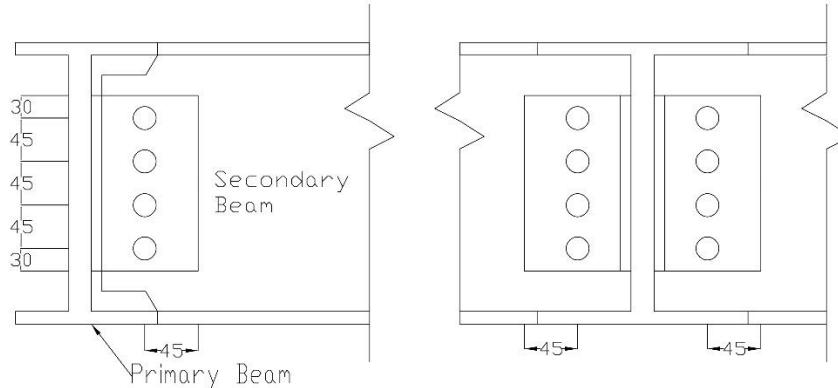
Figure showing the typical configuration of beam-to-beam connections
